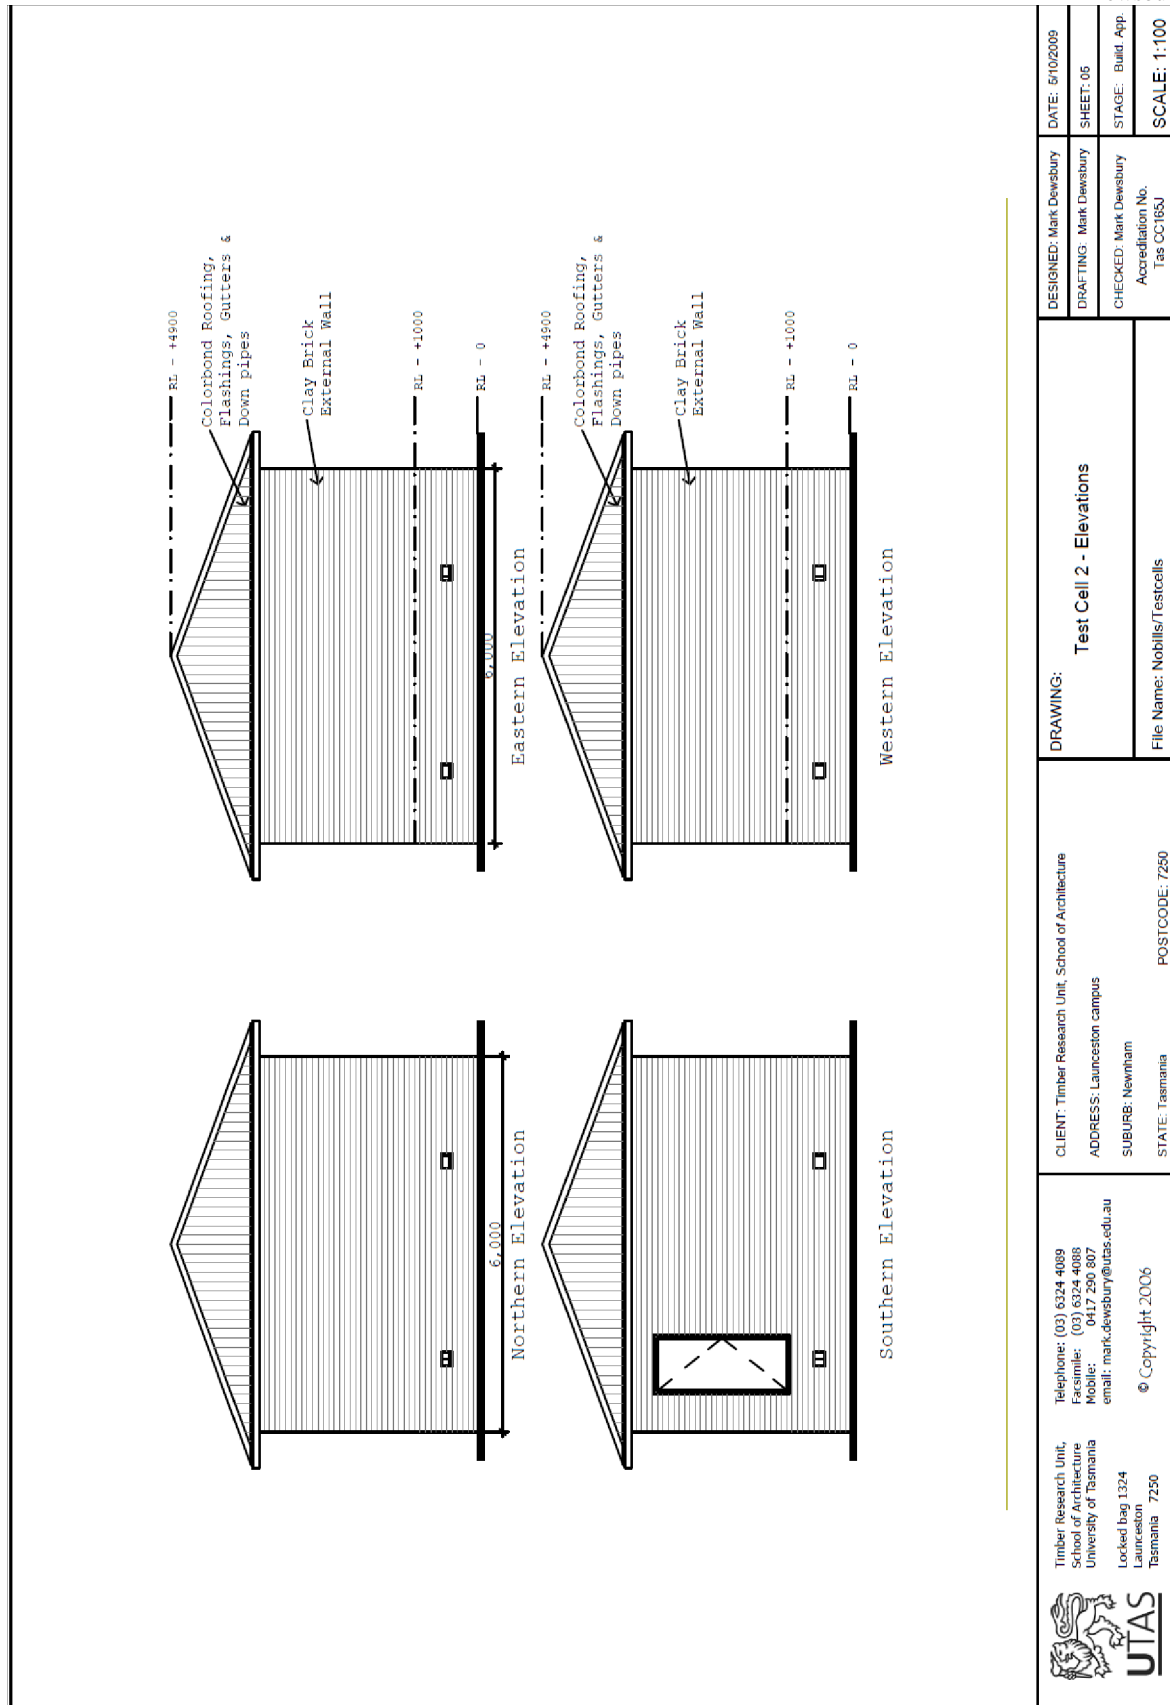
Test Cell 2 Elevations (not to scale)
